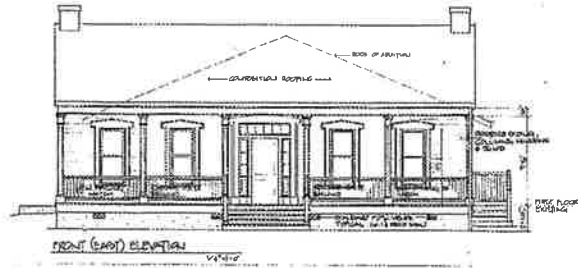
Proposed windows on the east facing side (front porch) of the primary dwelling.
